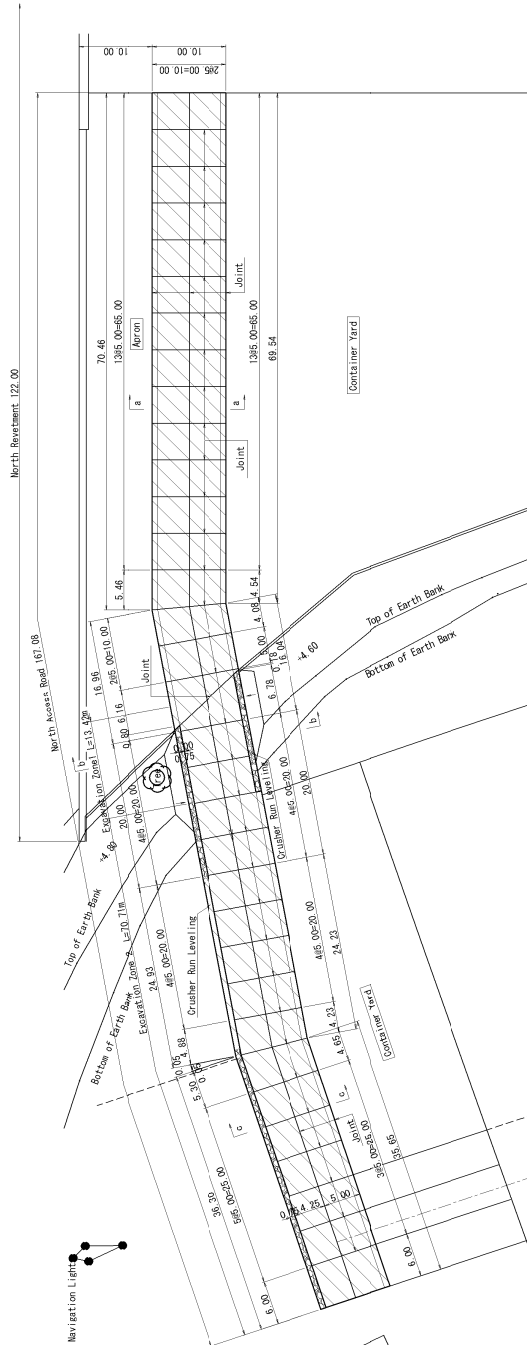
Dredging Plan adjacent to New International Berth
